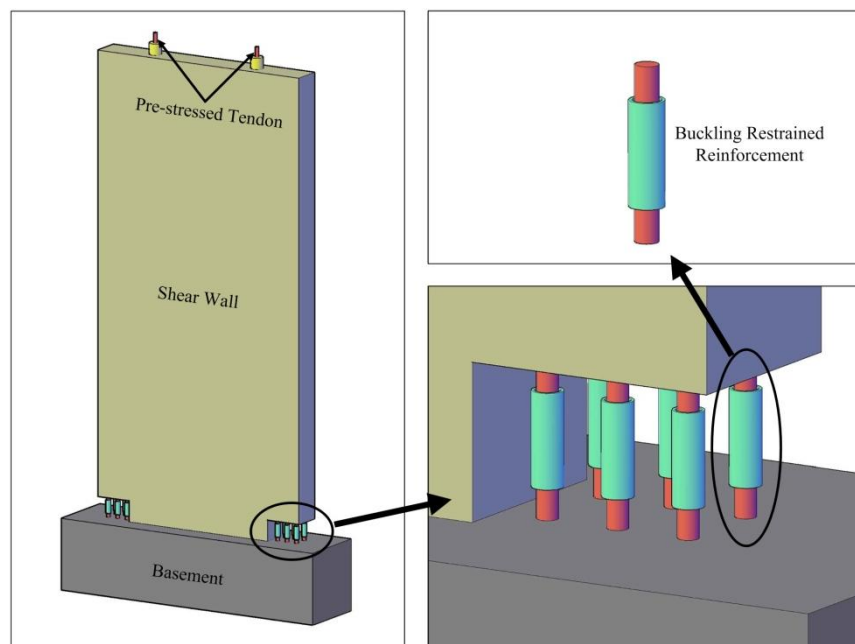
Sketch of the pre-stressed shear wall with bottom slits and BRRs
